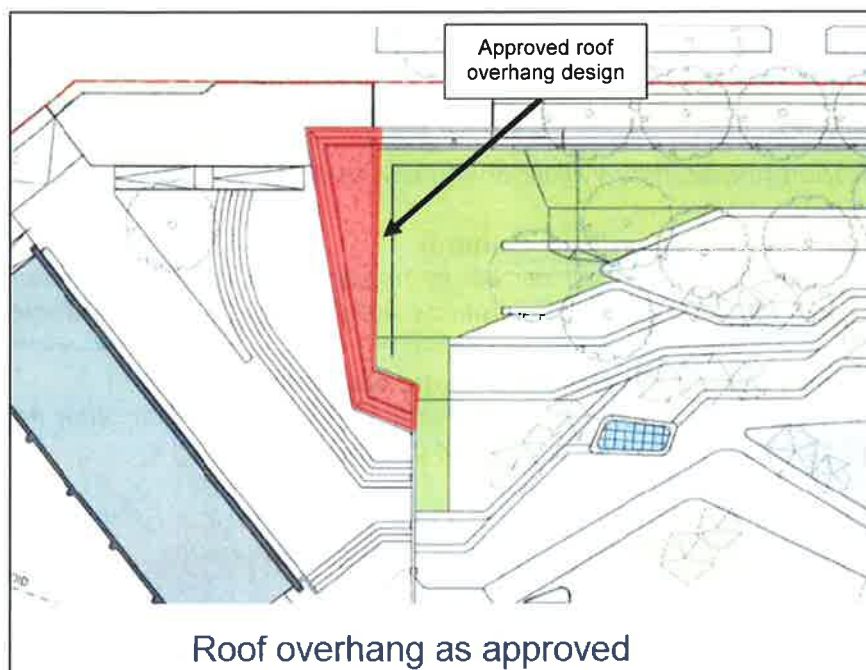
Approved roof overhang in red (Source: Applicant's Modification 1 EIS)
